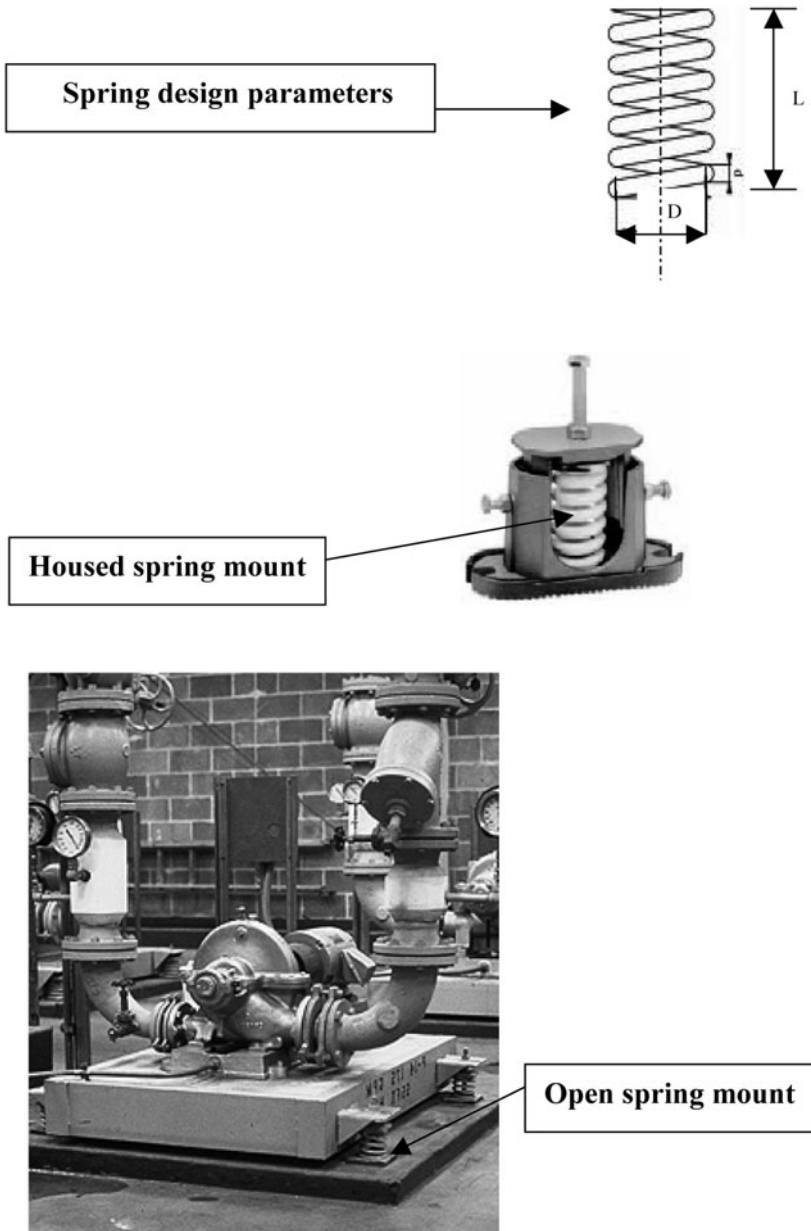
Open steel-spring mounts and concrete-filled framed inertia base. Also spring design parameters and photo of housed spring mount. Vertical up and down travel stops are incorporated in some housings. Side snubbers at the spring can be positioned using the horizontal adjustment bolts. To reduce high-frequency vibrations that may be transmitted through the steel spring, layers of ribbed or waffle embossed rubber pads are often installed under the base of the housing.
